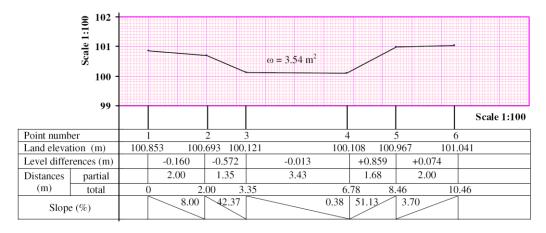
Transversal section through CC<sub>1</sub> canal 100 m upstream from the blocked culvert
